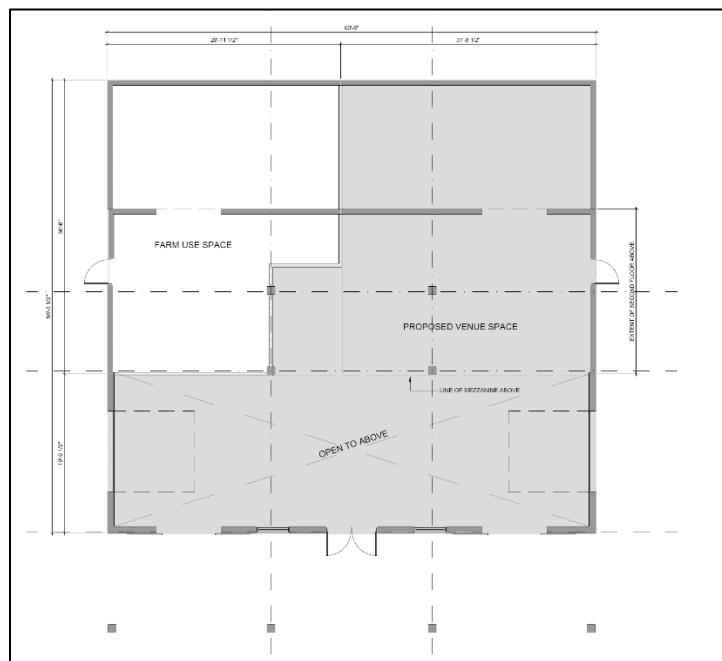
Floor Plan, Iconic Architecture - Nov 2024
